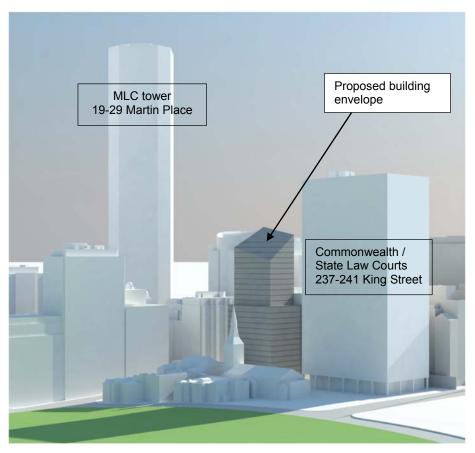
The proposed envelope as viewed from an elevated position within Hyde Park.
